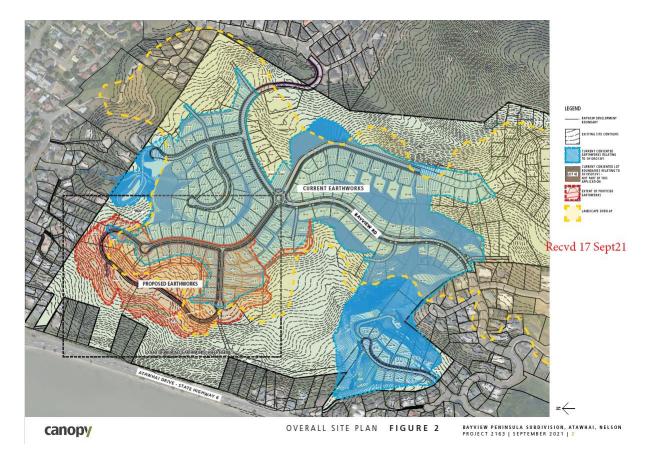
Overall Proposed and Consented Earthworks, Consented Lot Layout and Location of the Landscape Overlay
